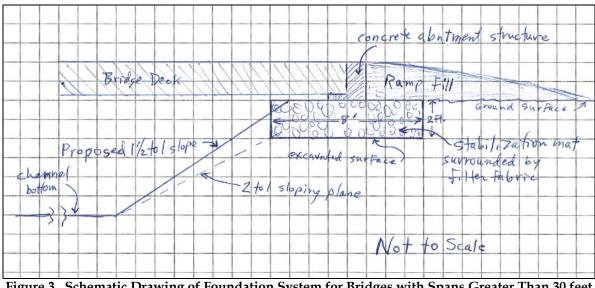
Schematic Drawing of Foundation System for Bridges with Spans Greater Than 30 feet (actual dimensions will vary)
